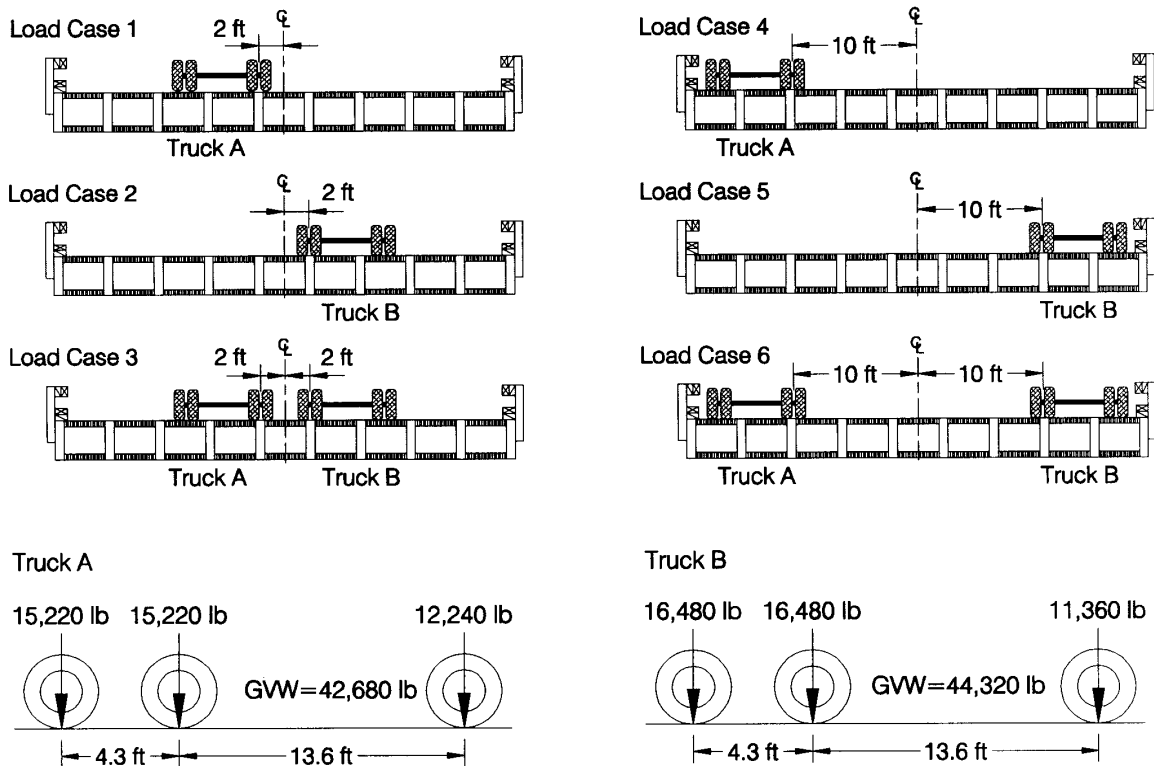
Load test 1 truck weights, axle spacings, and transverse load test positions.
